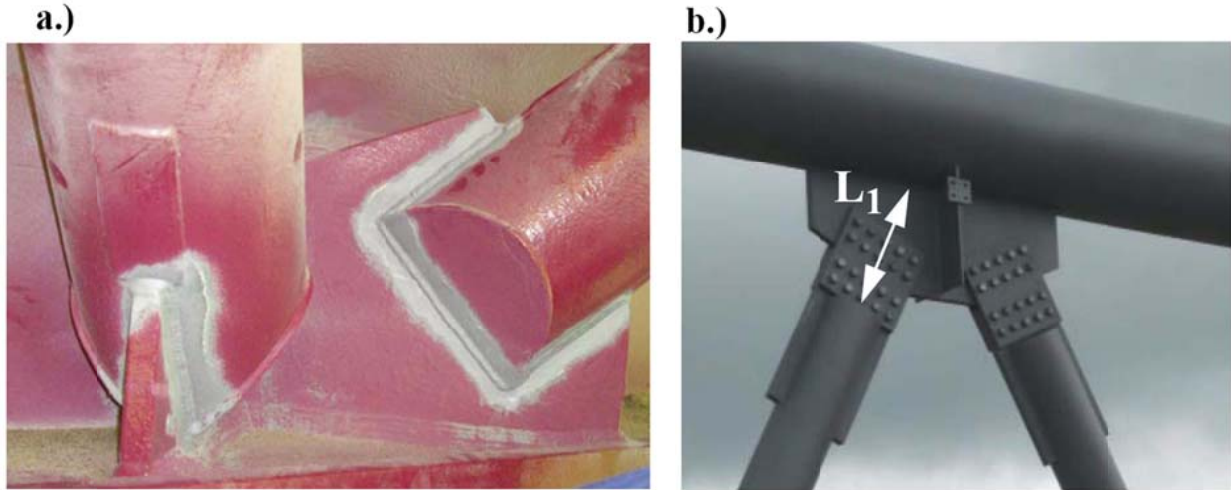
Examples for member joints – welded and bolted, respectively (from [1])
